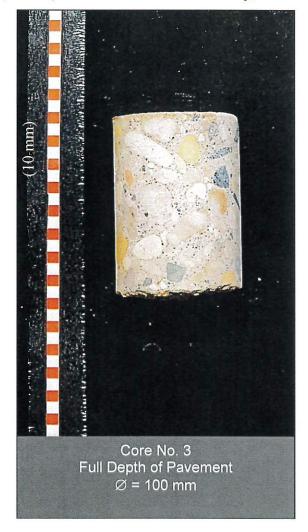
Specimen from Woodford Bay, Southbound Lane
